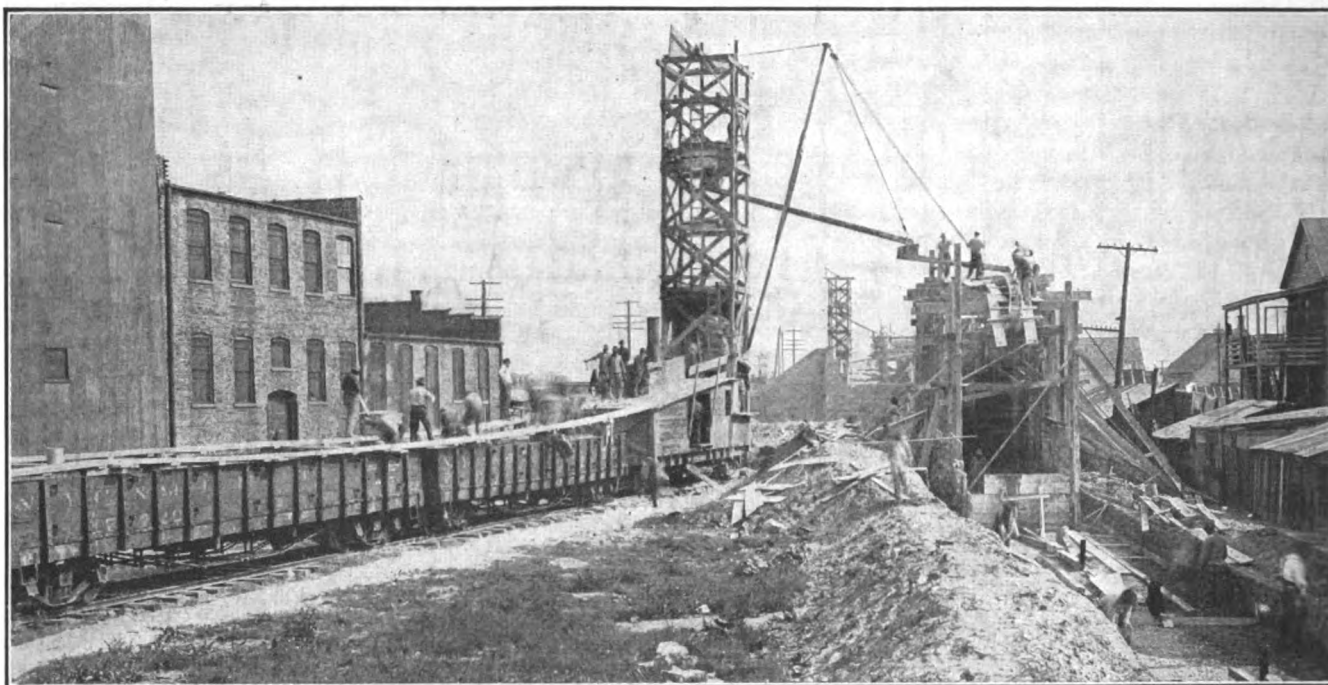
CONCRETING TRAIN FOR BUILDING ABUTMENTS AND RETAINING WALLS ON TRACK ELEVATION WORK AT CHICAGO; NEW YORK, CHICAGO & ST. LOUIS R.R.
